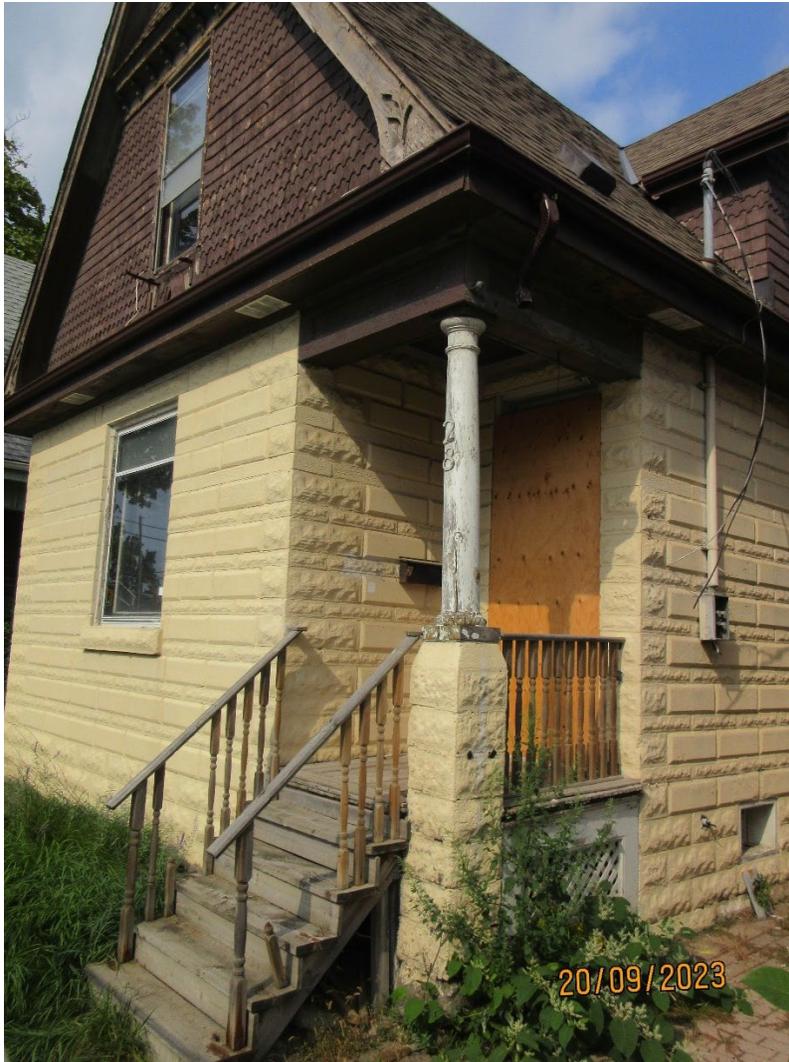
Photograph showing part of the building on the subject property at 28 Wellington Road (taken September 20, 2023).
